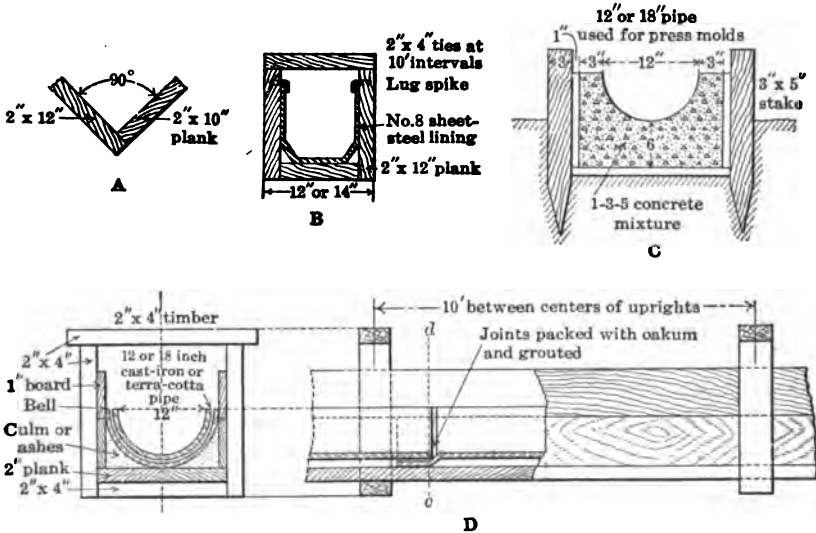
Types of troughs used for surface transportation of mine filler. A, plank trough; B, plank trough with sheet-iron lining; C, concrete trough; D, cross-section on line c-d, and longitudinal section of terra-cotta or cast-iron trough.
